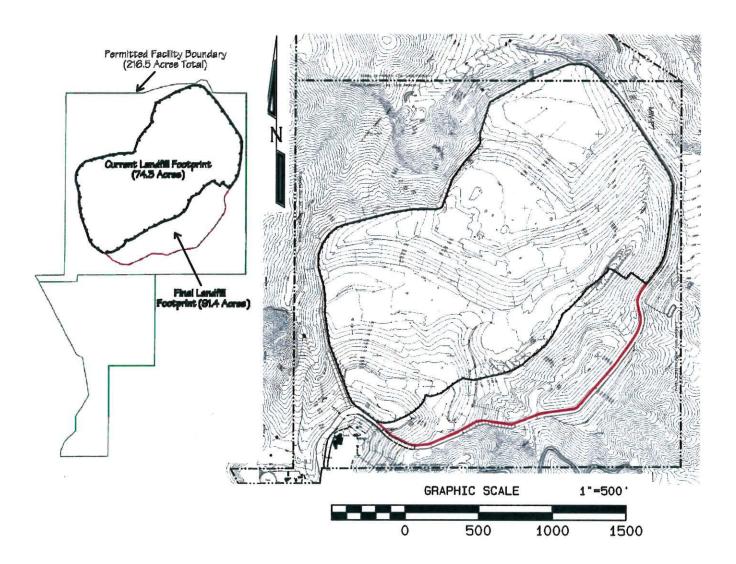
PLANNED FINAL FILL ELEVATIONS
